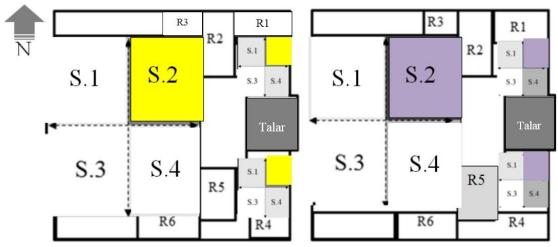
Evaluation of thermal comfort in open and semi-open spaces on the ground floor and first floor of a traditional building in Kashan during the winter and summer
